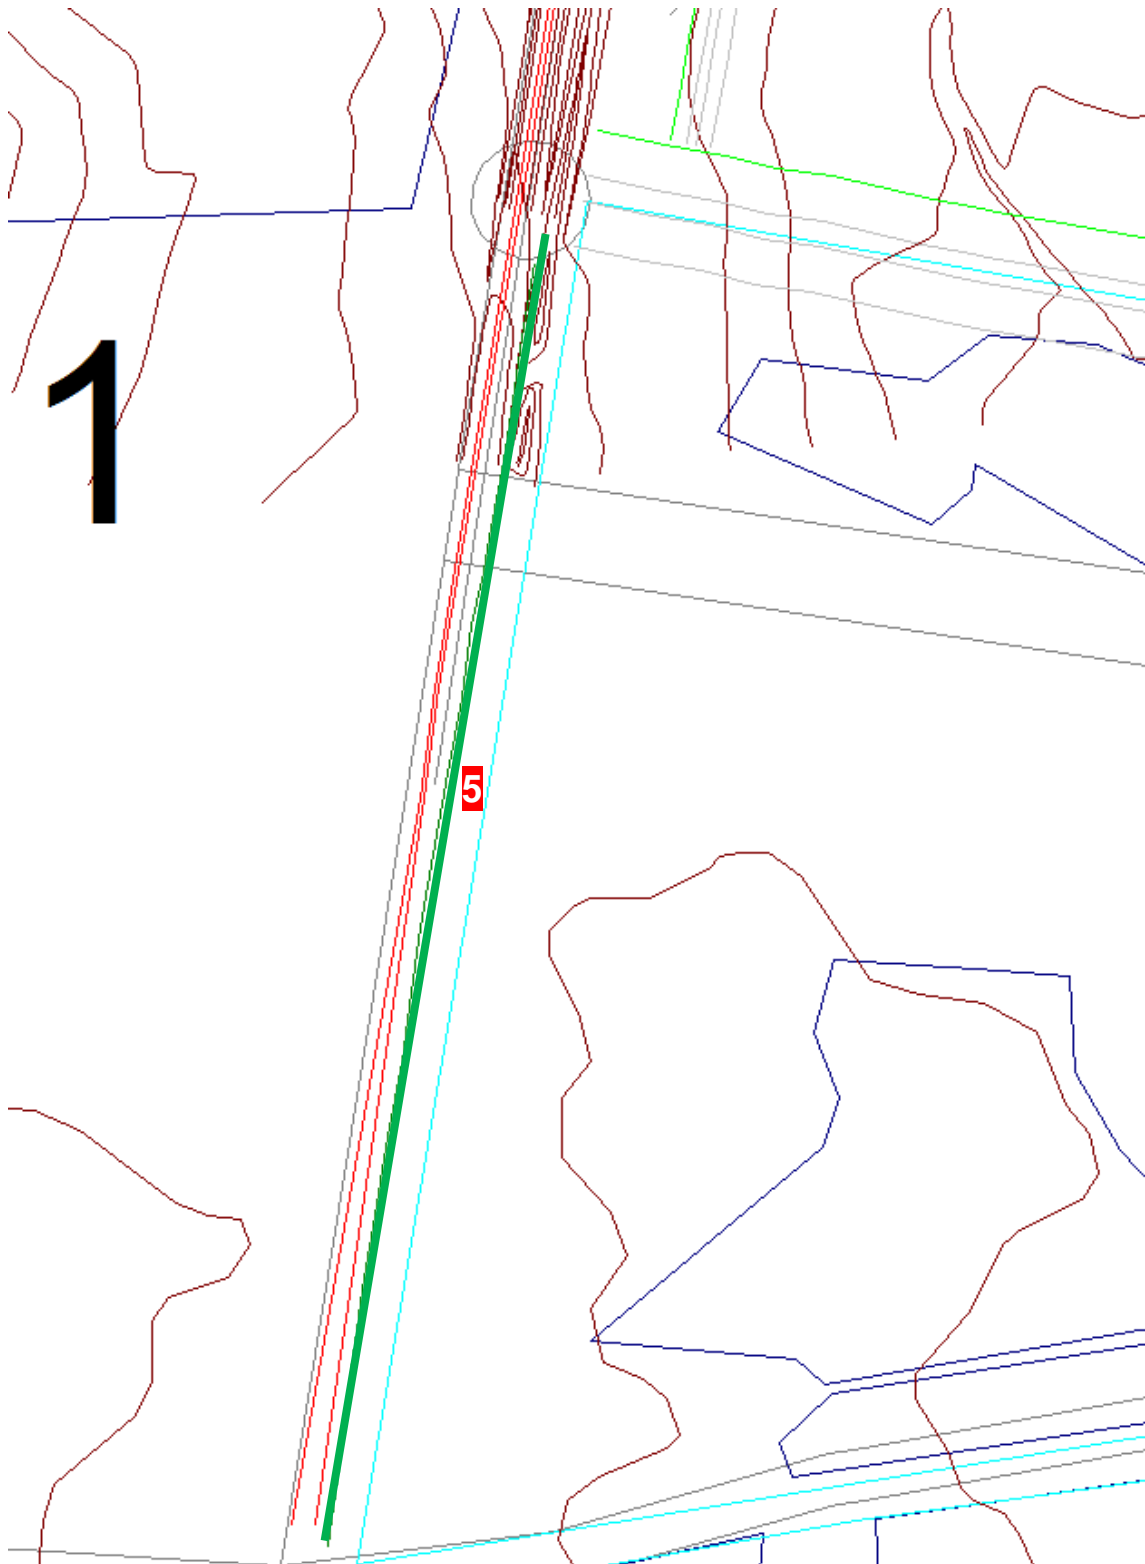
Layout of Barrier 5 - Adjacent to Haul Truck Road
